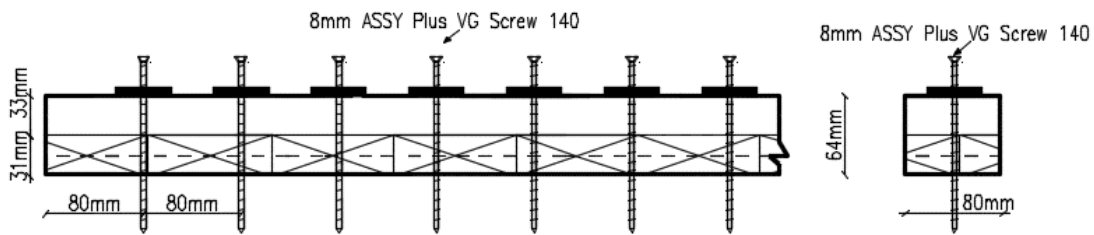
Series 1 layout: side section (left) and cross section (right)
